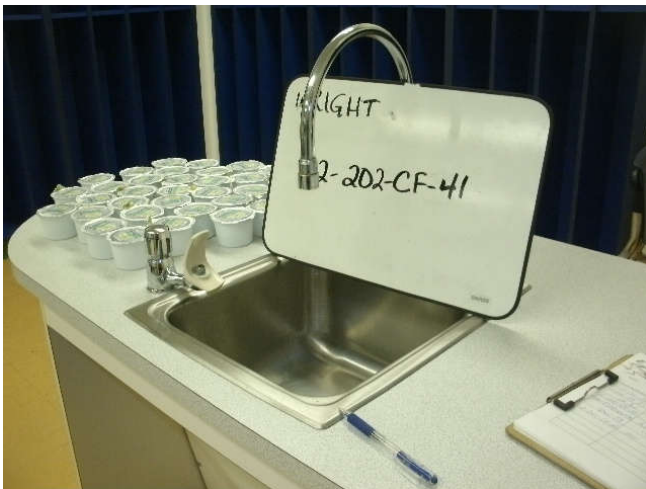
Classroom faucet w/bubbler, located on the 2nd floor, in room 202.
